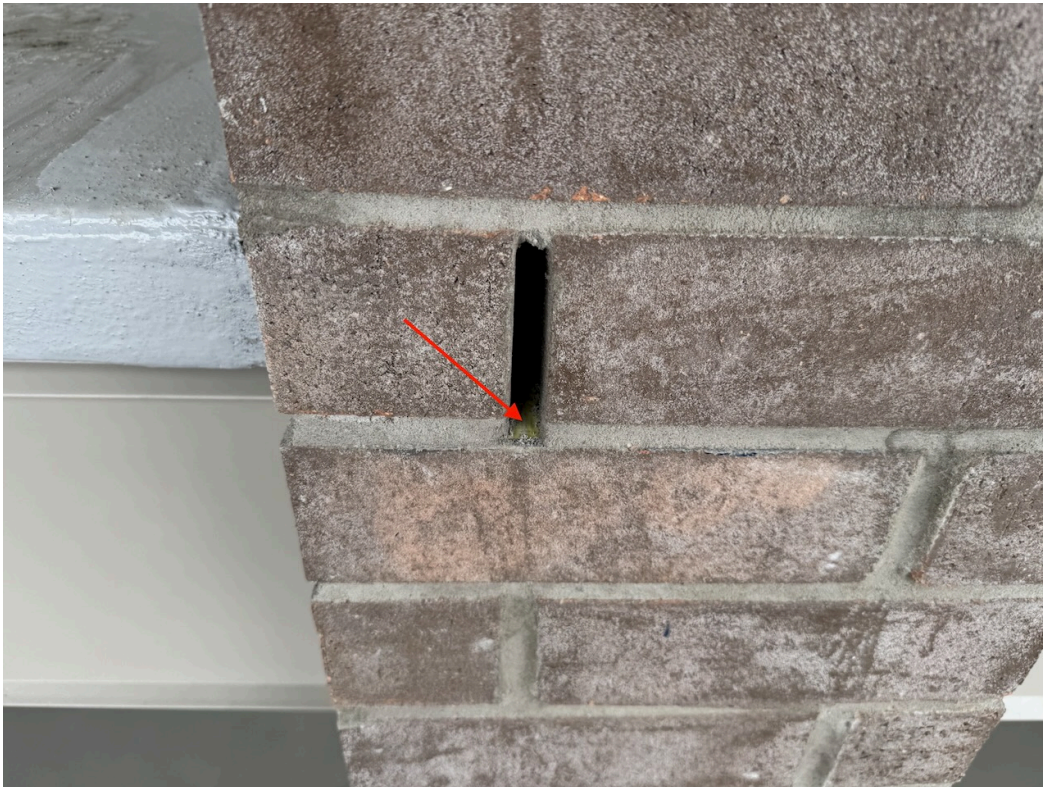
Blueskin TWF membrane installed at the balcony slab level through the masonry column cladding.
